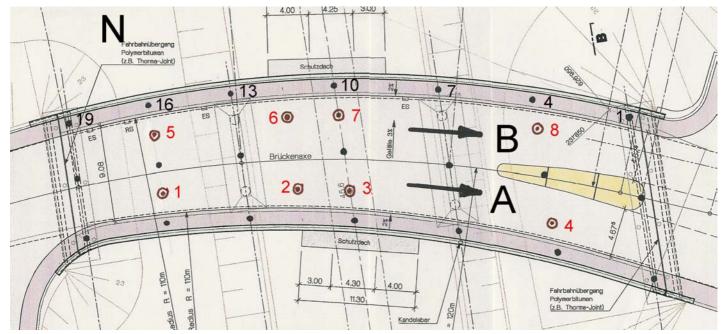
Bridge plan view. Indicated are the North side of the bridge (N), the lanes of the rollers (A) and (B), the 21 points of the measurement point grid used for the determination of the bridge natural dynamic properties (numbers given on one bridge curb only; No. 10 = reference point) and the measurement points used during the compaction tests (1 to 4 in lane A, 5 to 8 in lane B).
